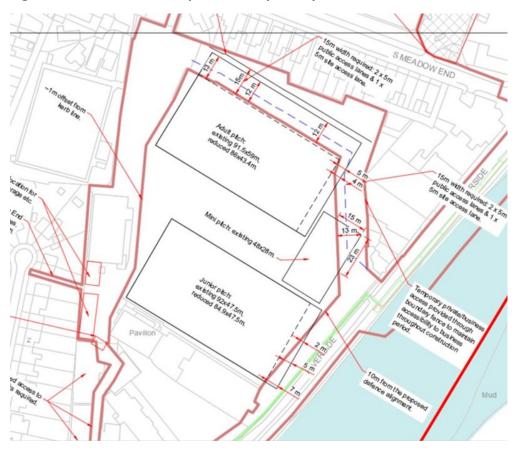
Extent of BAC/EE pitches temporarily out of use in metres
